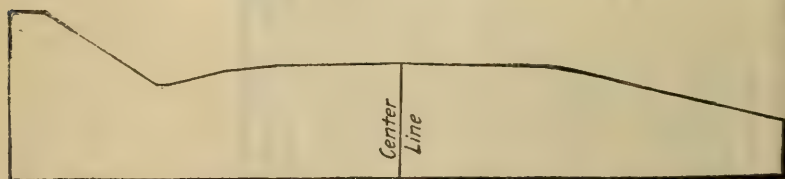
Transparent templet for use on cross-sections giving finished shape of road.
